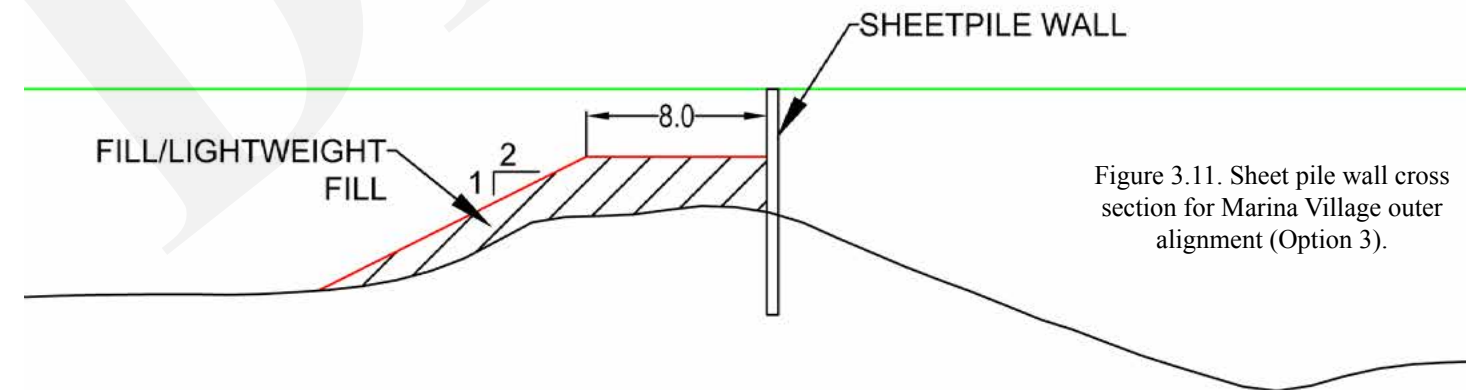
Sheet pile wall cross section for Marina Village outer alignment (Option 3).
